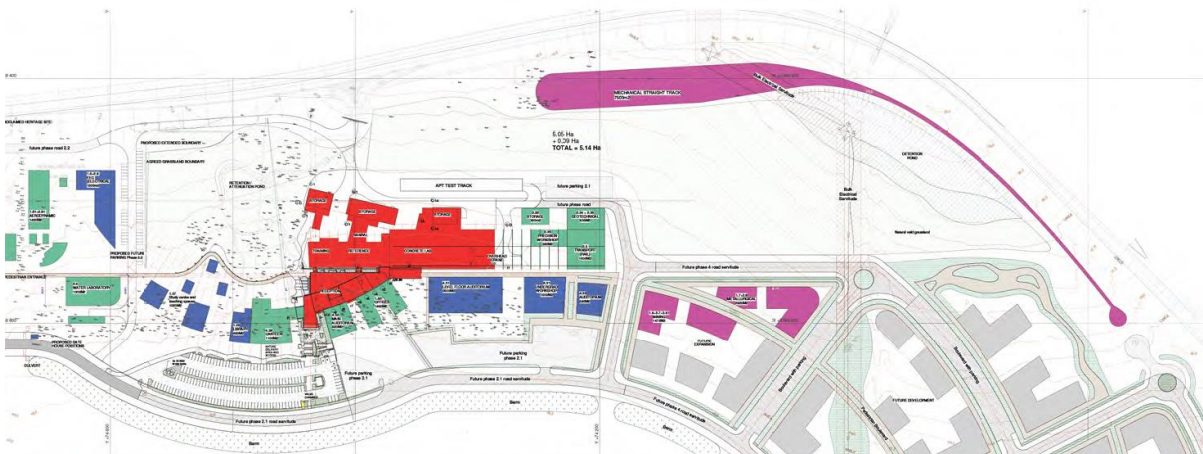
Architectural drawing showing proposed test track (magenta, top right). Red buildings have been completed
